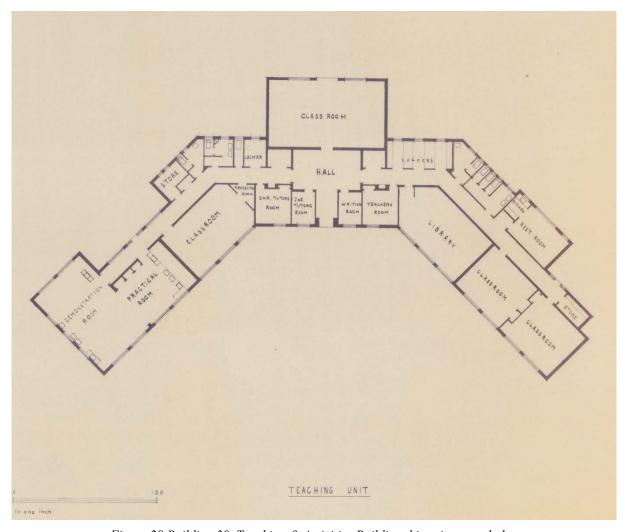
Building 38, Teaching & Activities Building, historic ground plan
